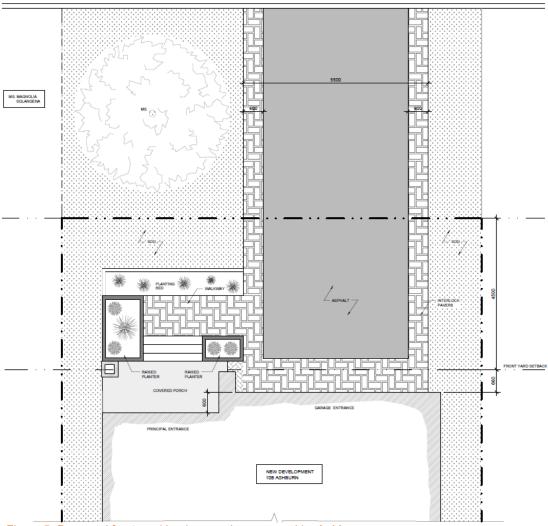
Proposed front yard landscape plan prepared by A. Marcoux
